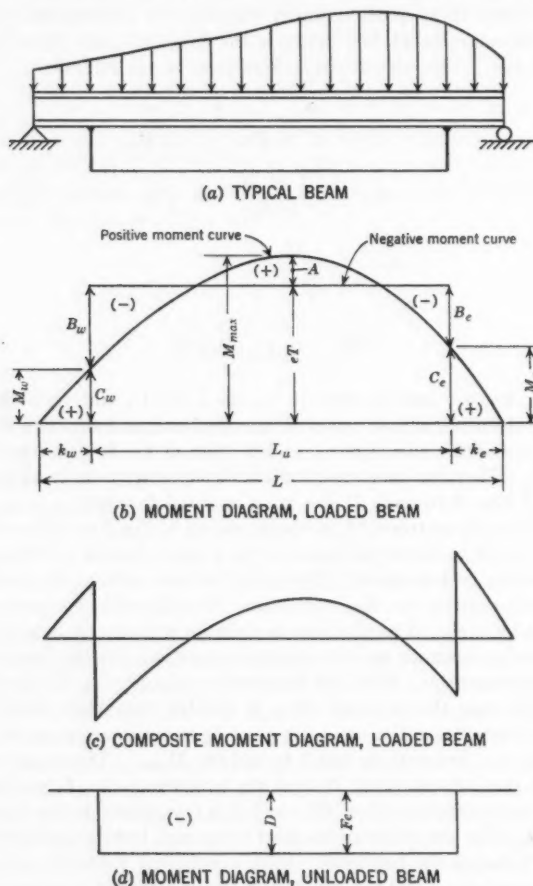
TYPICAL PRESTRESSED TRUSS-BEAM
